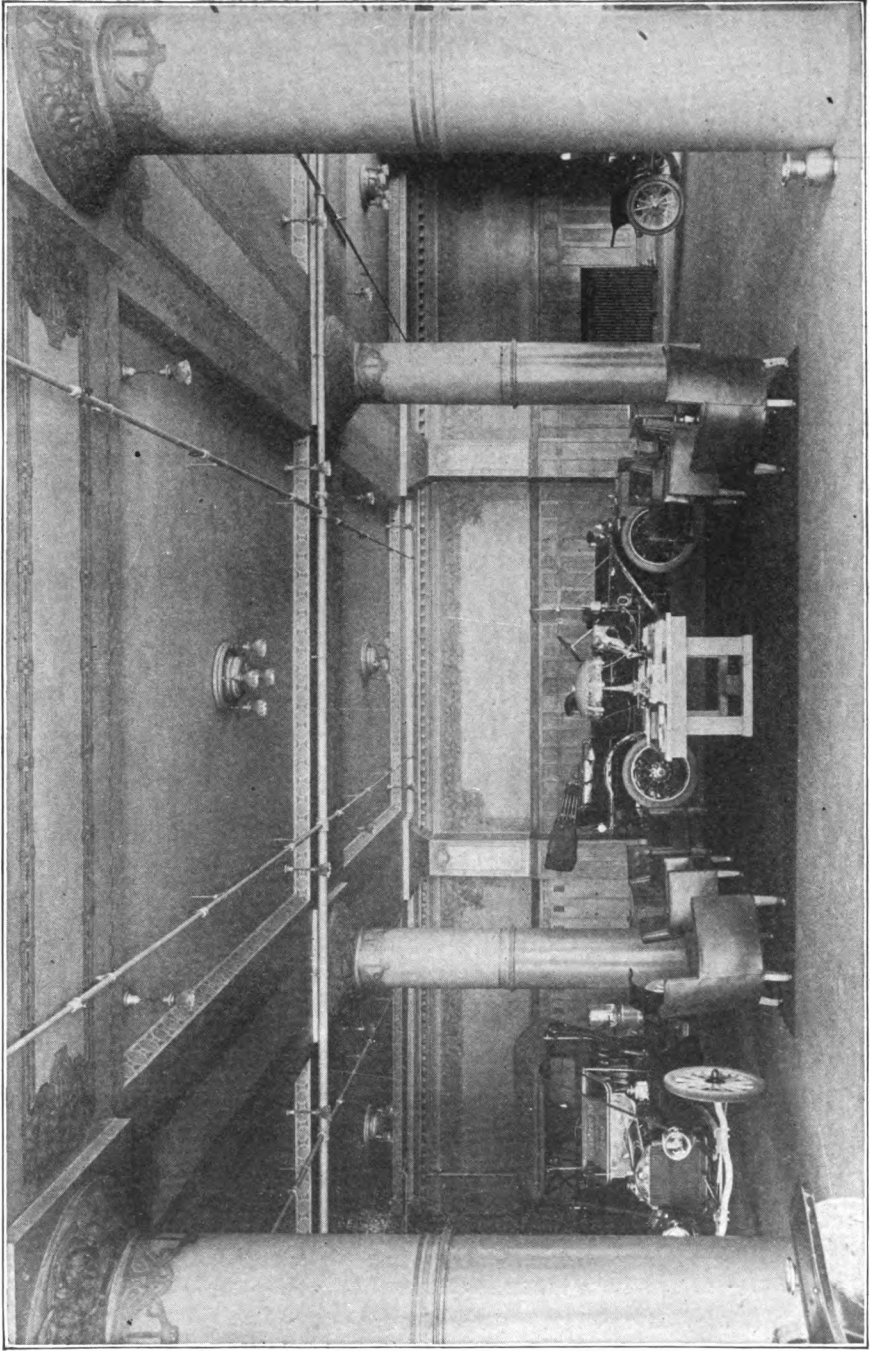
An Approved Type of Fireproof Building, Reinforced Concrete Panel Slab Construction, "C & S Type," with Automatic Sprinklers
